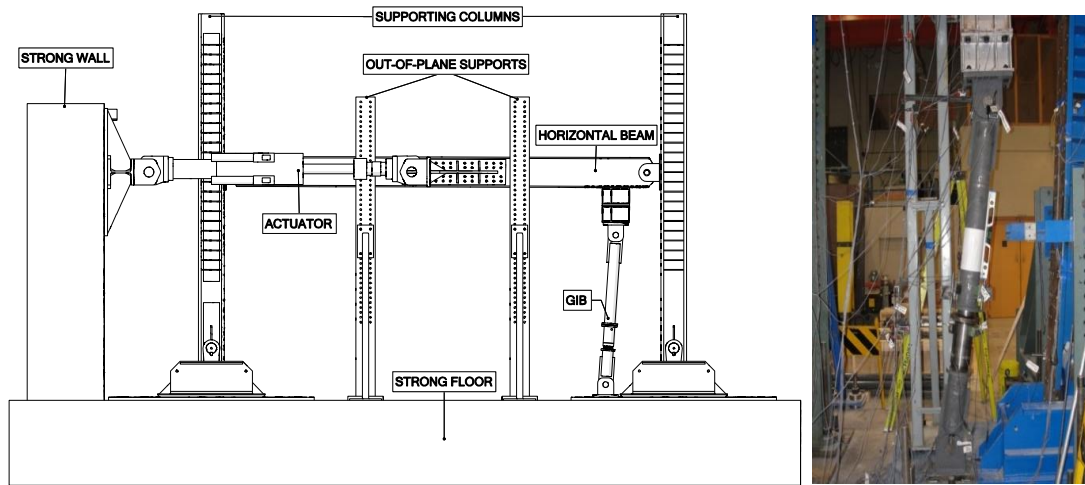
Phase I Test Setup: (a) Schematic Drawing; (b) Test Photo
